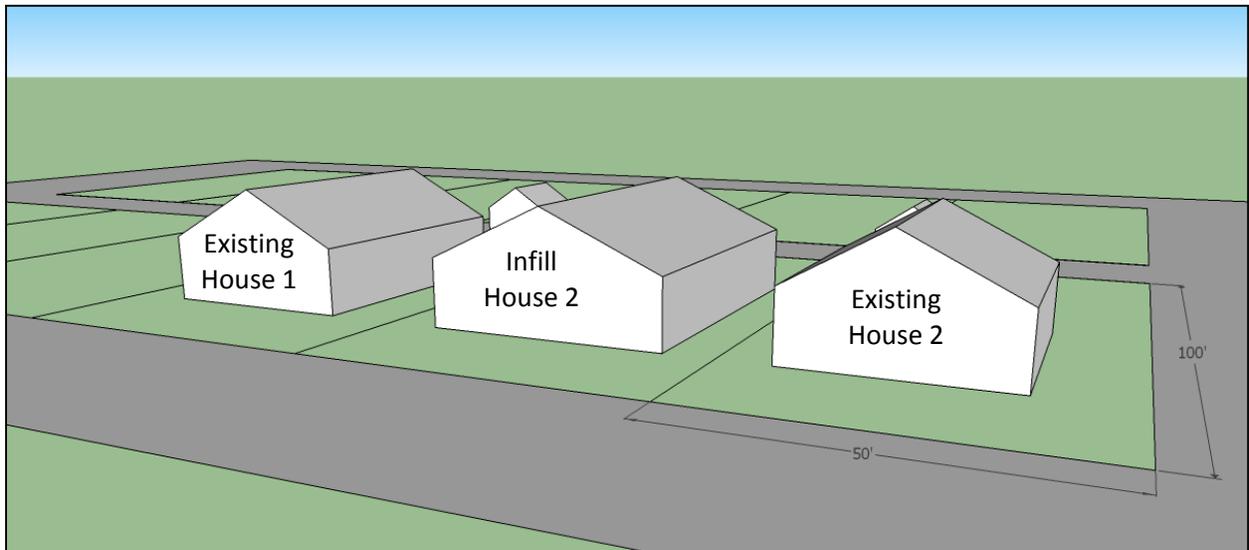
Street/front elevation for single-story structures, including the larger infill house, based on the square footage in Table 3.
